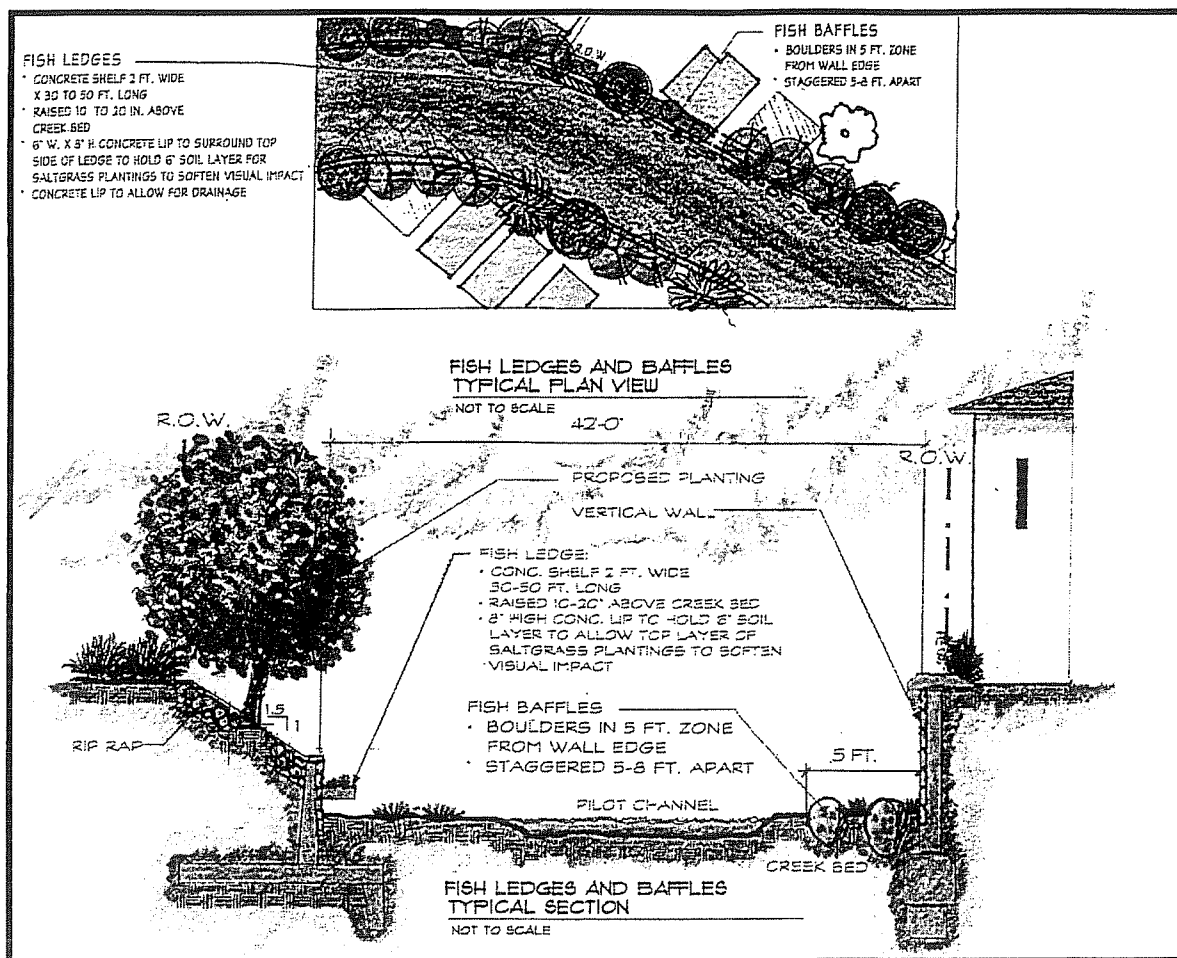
Representative Cross Section Showing Fish Ledges and Baffles along the Walls Upstream of Mason Street
